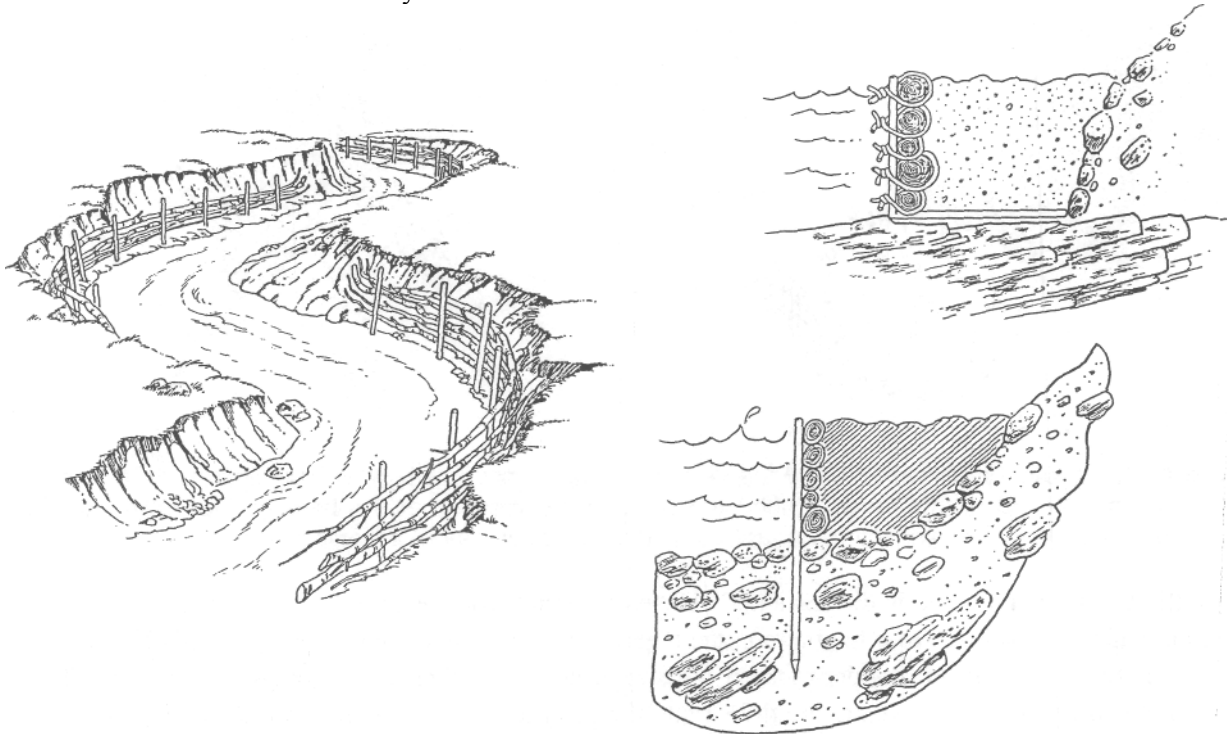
Live bank protection can be used to control erosion on the outside of curves. The backfill has been removed in these drawings for clarity. Typically, the undercut bank would be resloped to backfill be structures. Live bank protection can be used where the stream has eroded the materials down to bedrock (above) or where unconsolidated materials are still present (below). Backfill is shown in these sections and the undercut banks have been resloped.
